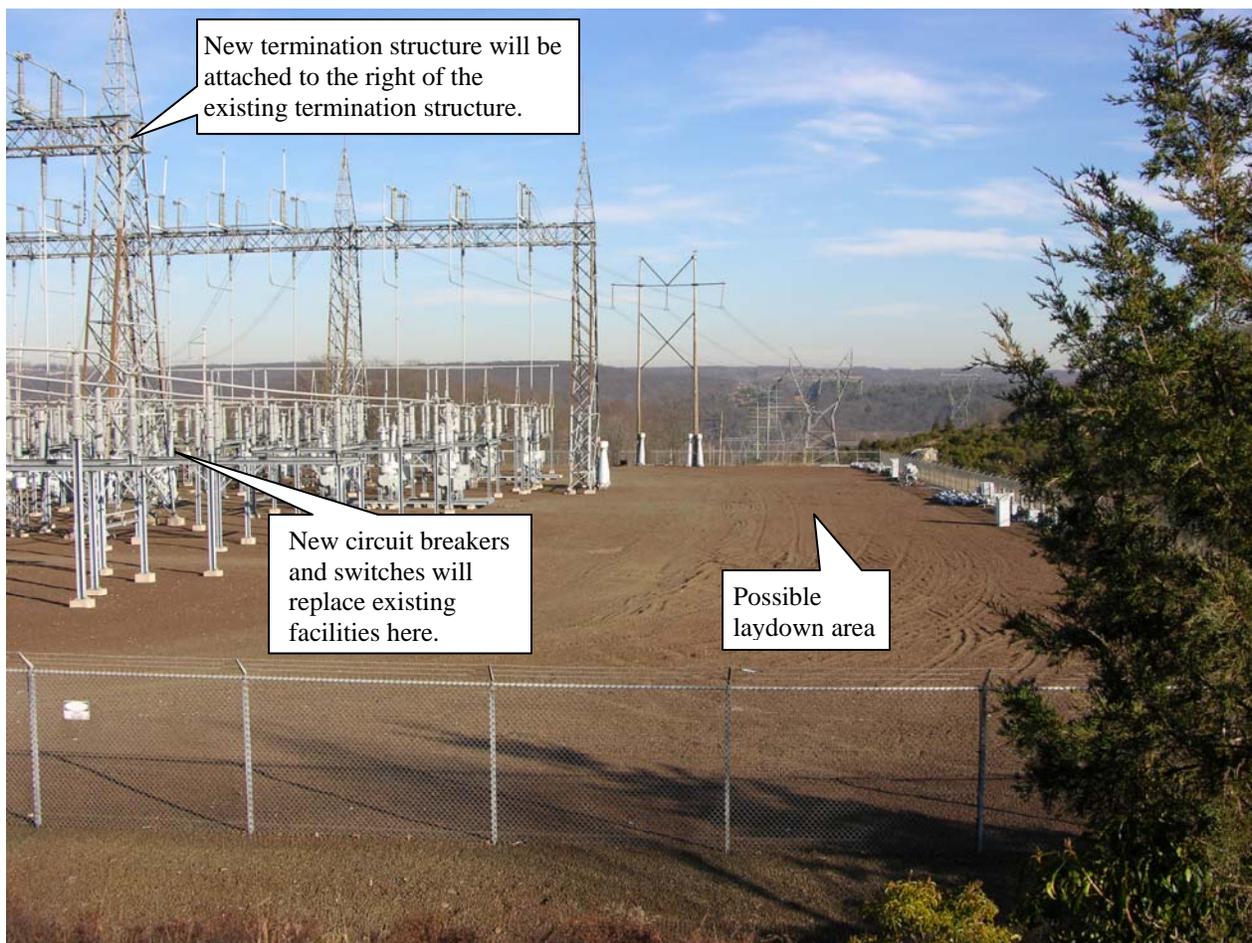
Looking East at existing Scovill Rock Switching Station.
